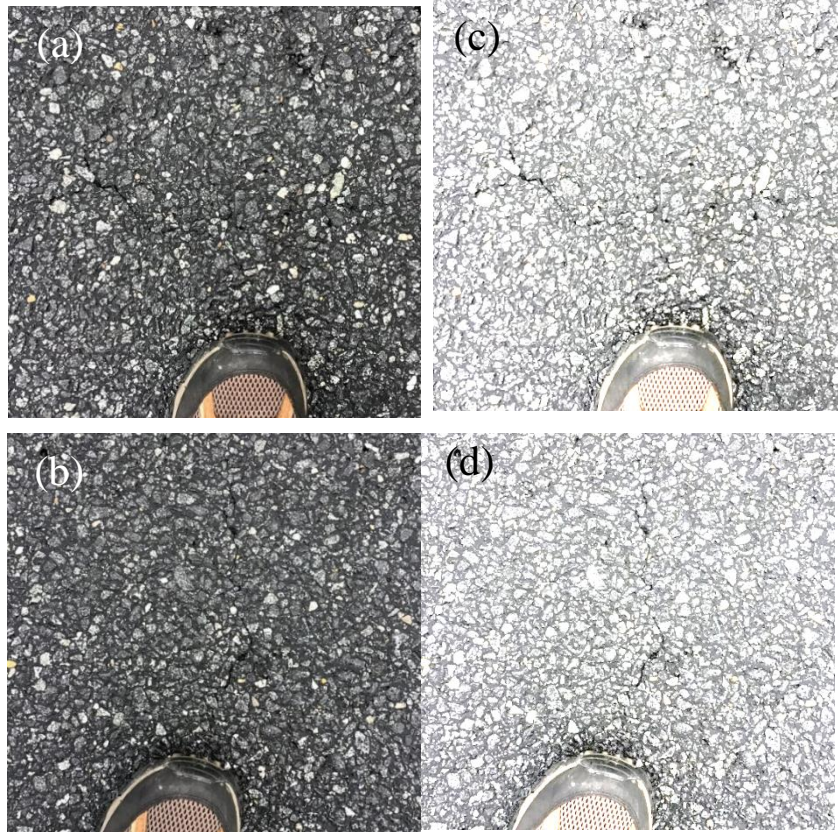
The Surface of the CCPR (N4) Pavement Section. (a) & (b) Surface Cracks at N4, (c) & (d) Enhanced Photo of the Surface Cracks (Date Taken: 01/25/2021).
